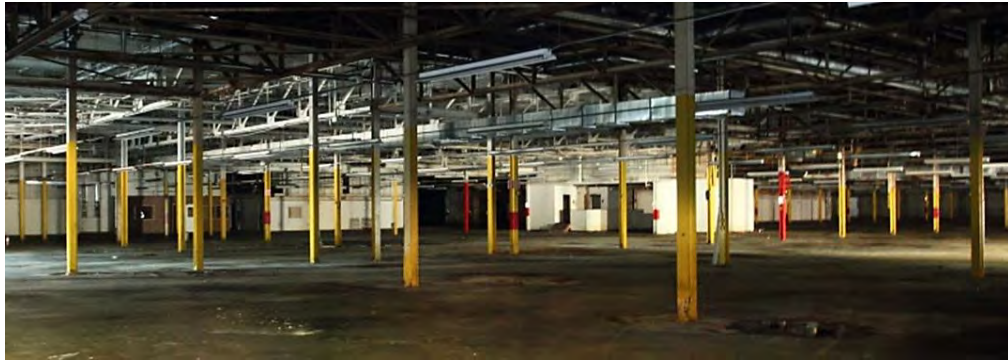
Interior of body of plant cleared of all equipment (Legeros 2013)
